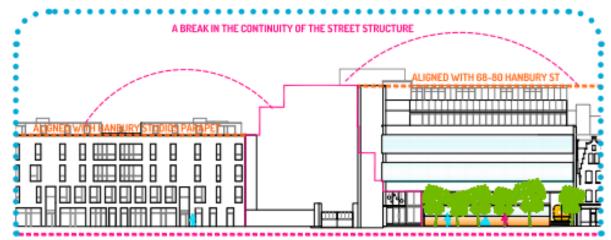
Proposed Elevation on Hanbury Street (Design & Access Statement)
